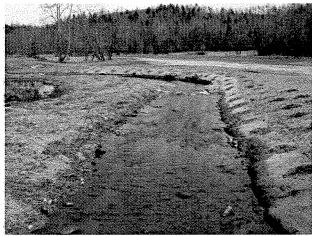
Looking downstream from culvert installed at MS Station 33+00. (9/27/04)
